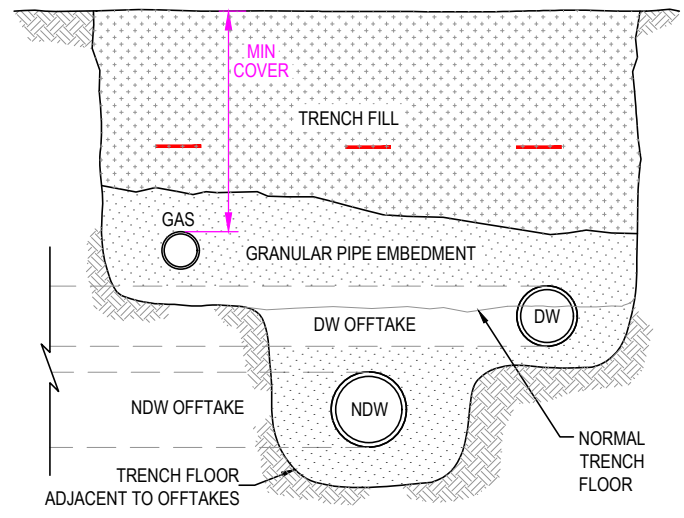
E: SHARED TRENCH WITH STEPPED TRENCH FLOOR LEVEL (ADJACENT TO OFFTAKES)
